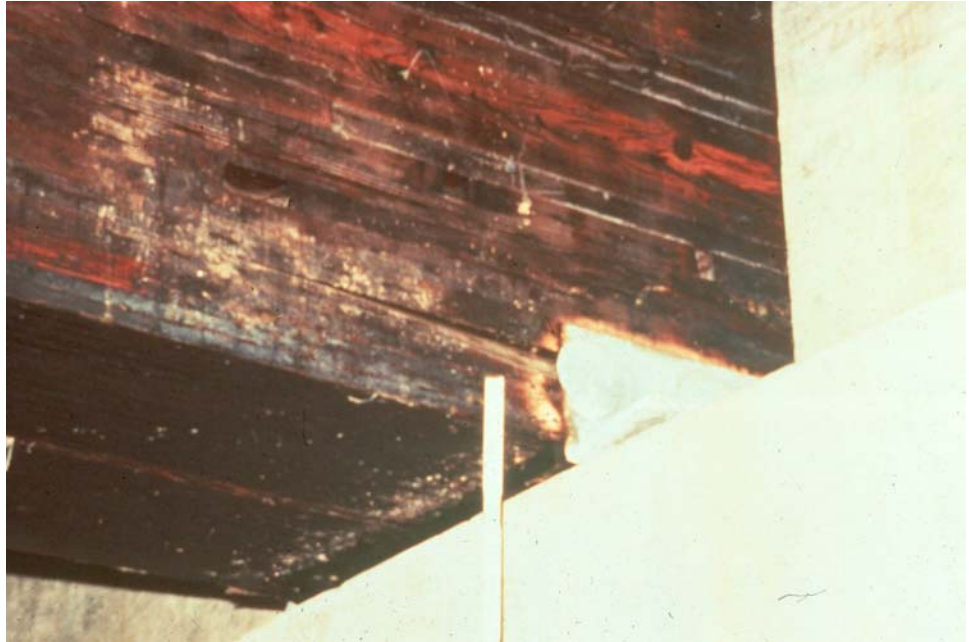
Close-up View of End of a Stressed Timber Bridge Showing Laminations
